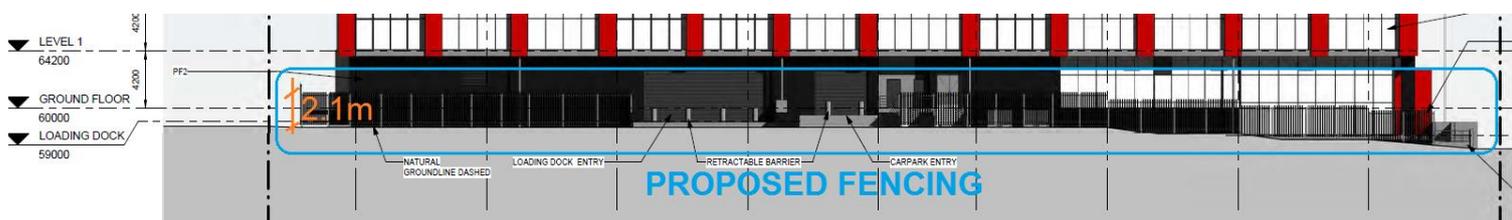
Excerpt from East Elevation Plans identifying 2.1m fencing around perimeter of building
